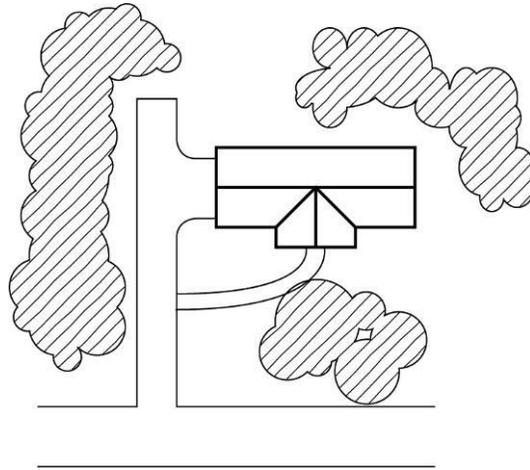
Tree save areas should include tree stands outside of the building envelope and outside driveway/parking areas.
